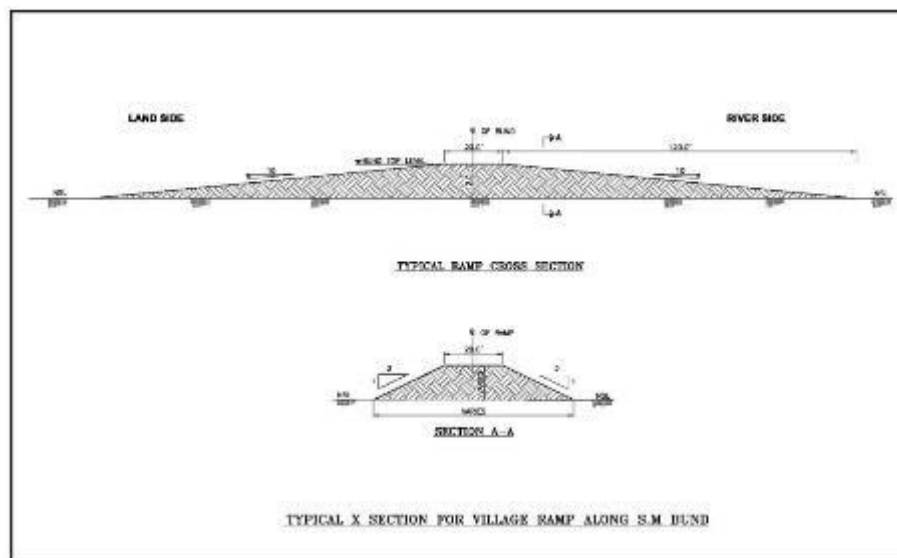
Option 1: Recoupmnt of Damaged Stone Pitching and Reconstruction of Existing Embankment Ramps
